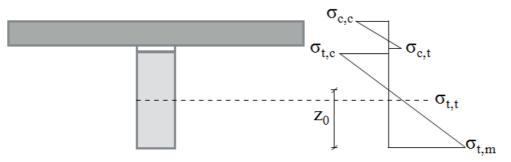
Example of stress distribution in a timber-concrete composite beam.
